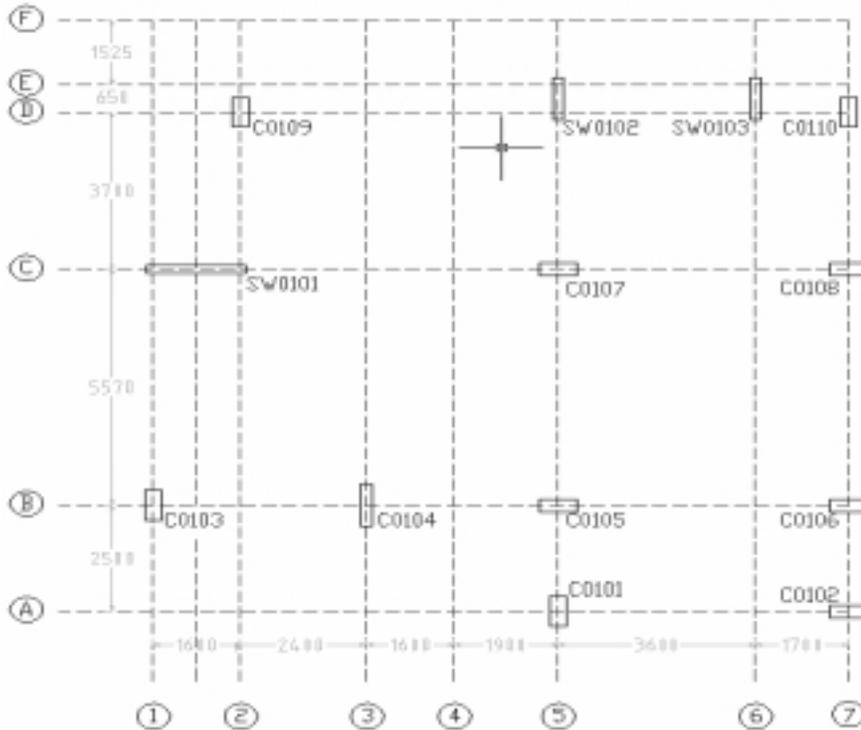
Base Floor Column & Shear Wall Layout of Building 4
